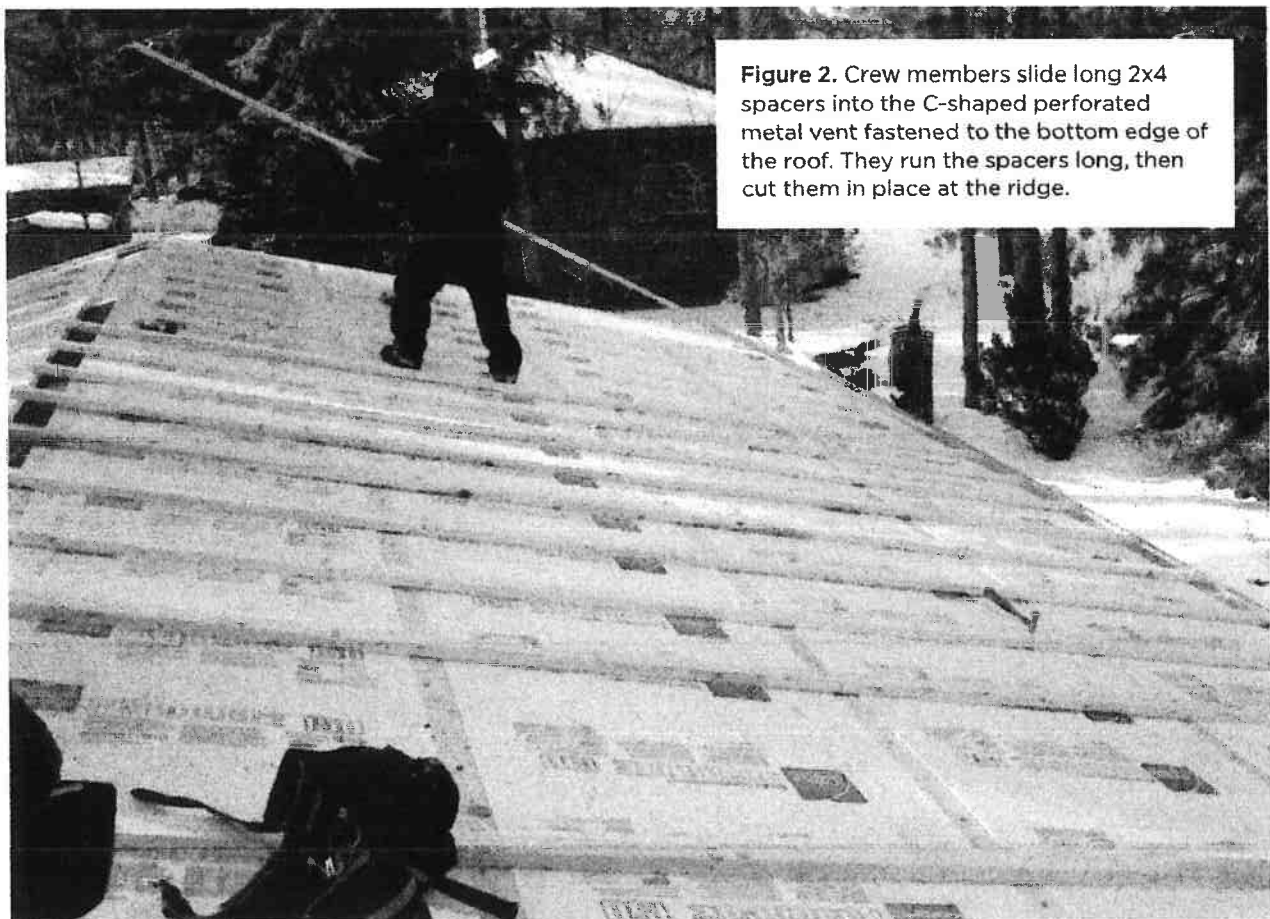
Crew members slide long 2x4 spacers into the C-shaped perforated metal vent fastened to the bottom edge of the roof. They run the spacers long, then cut them in place at the ridge.
